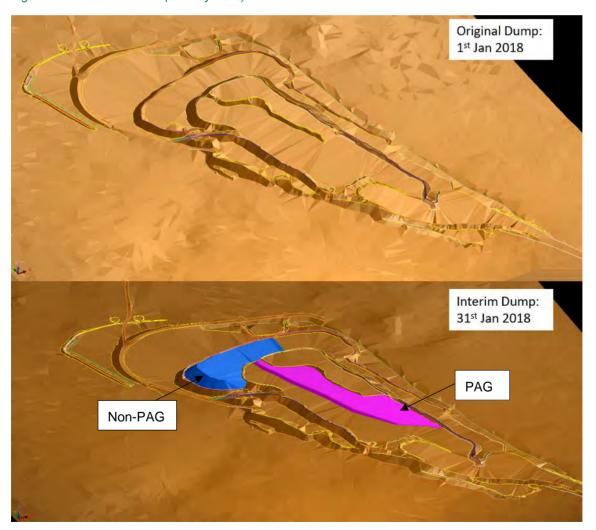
Waste Rock Plan (January 2018) - Isometric View
